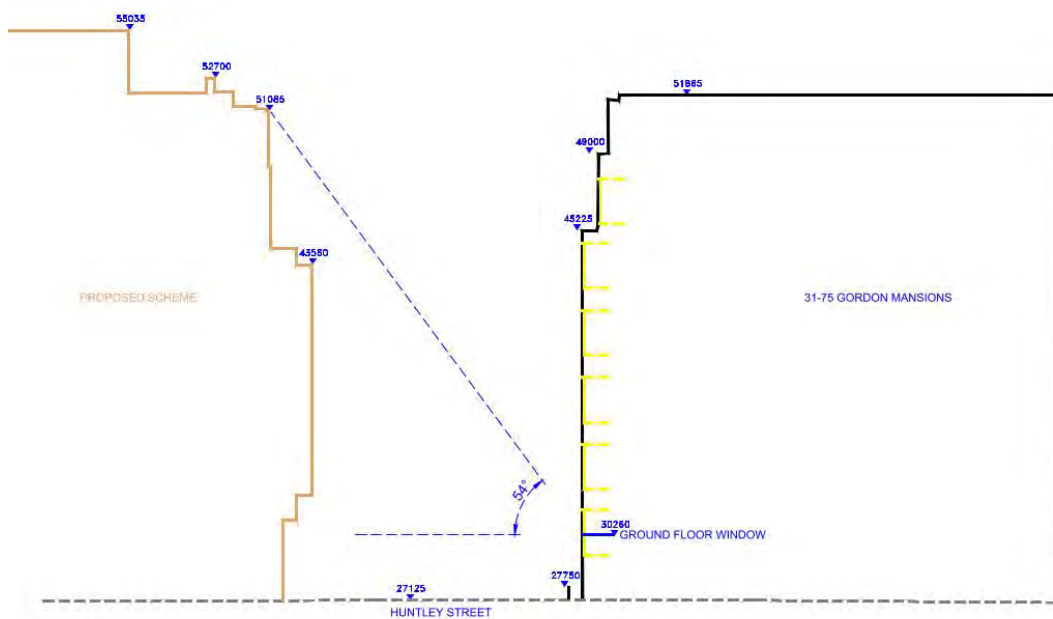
Section and angle line through Gordon Mansion and site (proposal)
